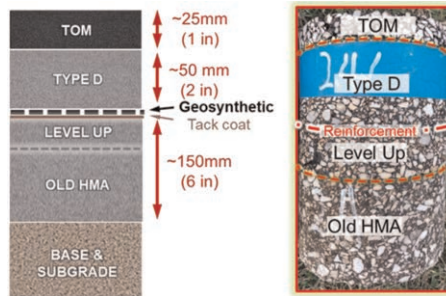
Roadway profile of test sections: (a) Schematic design profile; (b) Example picture of asphalt core.
